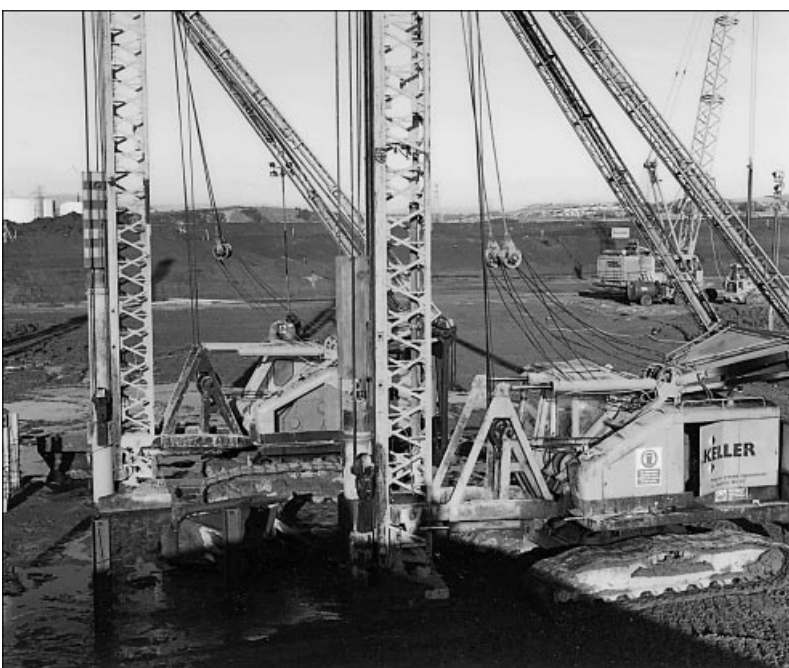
Pile driving works showing installation of 480 mm diameter cast-in-place piles
